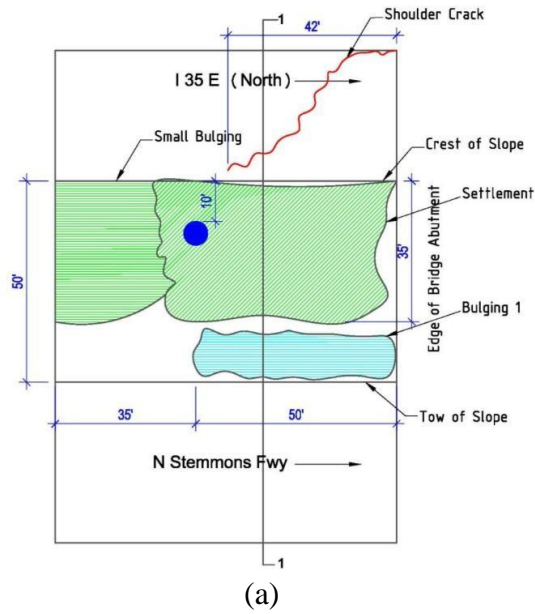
Schematic of the failure condition, (a) Front elevation view,
